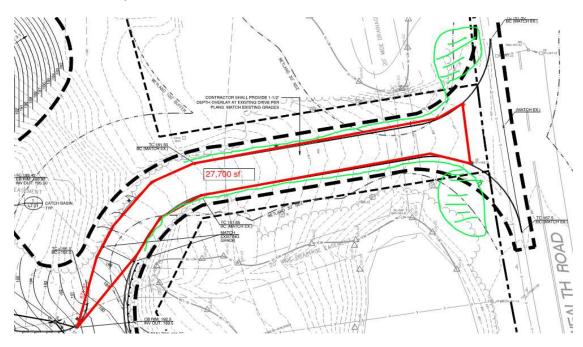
Alternative 2B drainage area (highlighted in red) would flow to a grass swale on each side of the road which would flow to a rain garden for treatment before reaching the existing stormwater collection system.
